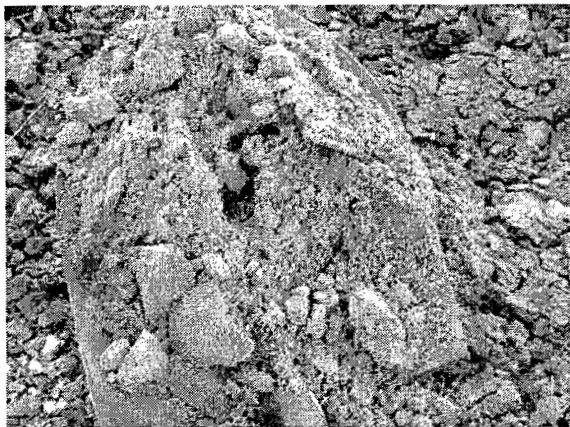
Close-up photo of soil from Test Pit #2 (Structure #87).
